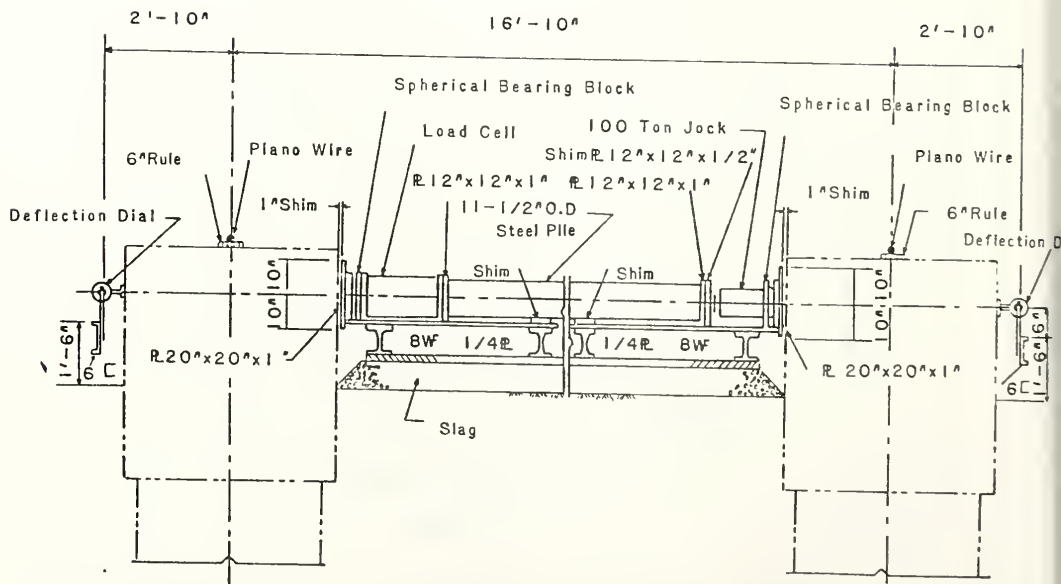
Typical Setup For Lateral Load Tests. (From Davisson And Stalley, 1970).
